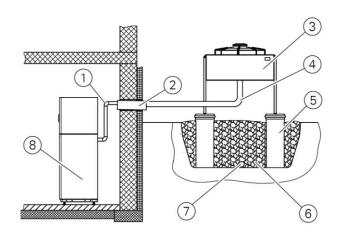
Installing a non-buried connecting pipework, using an AIR 80 C13A with a VHS 80 as an example.
